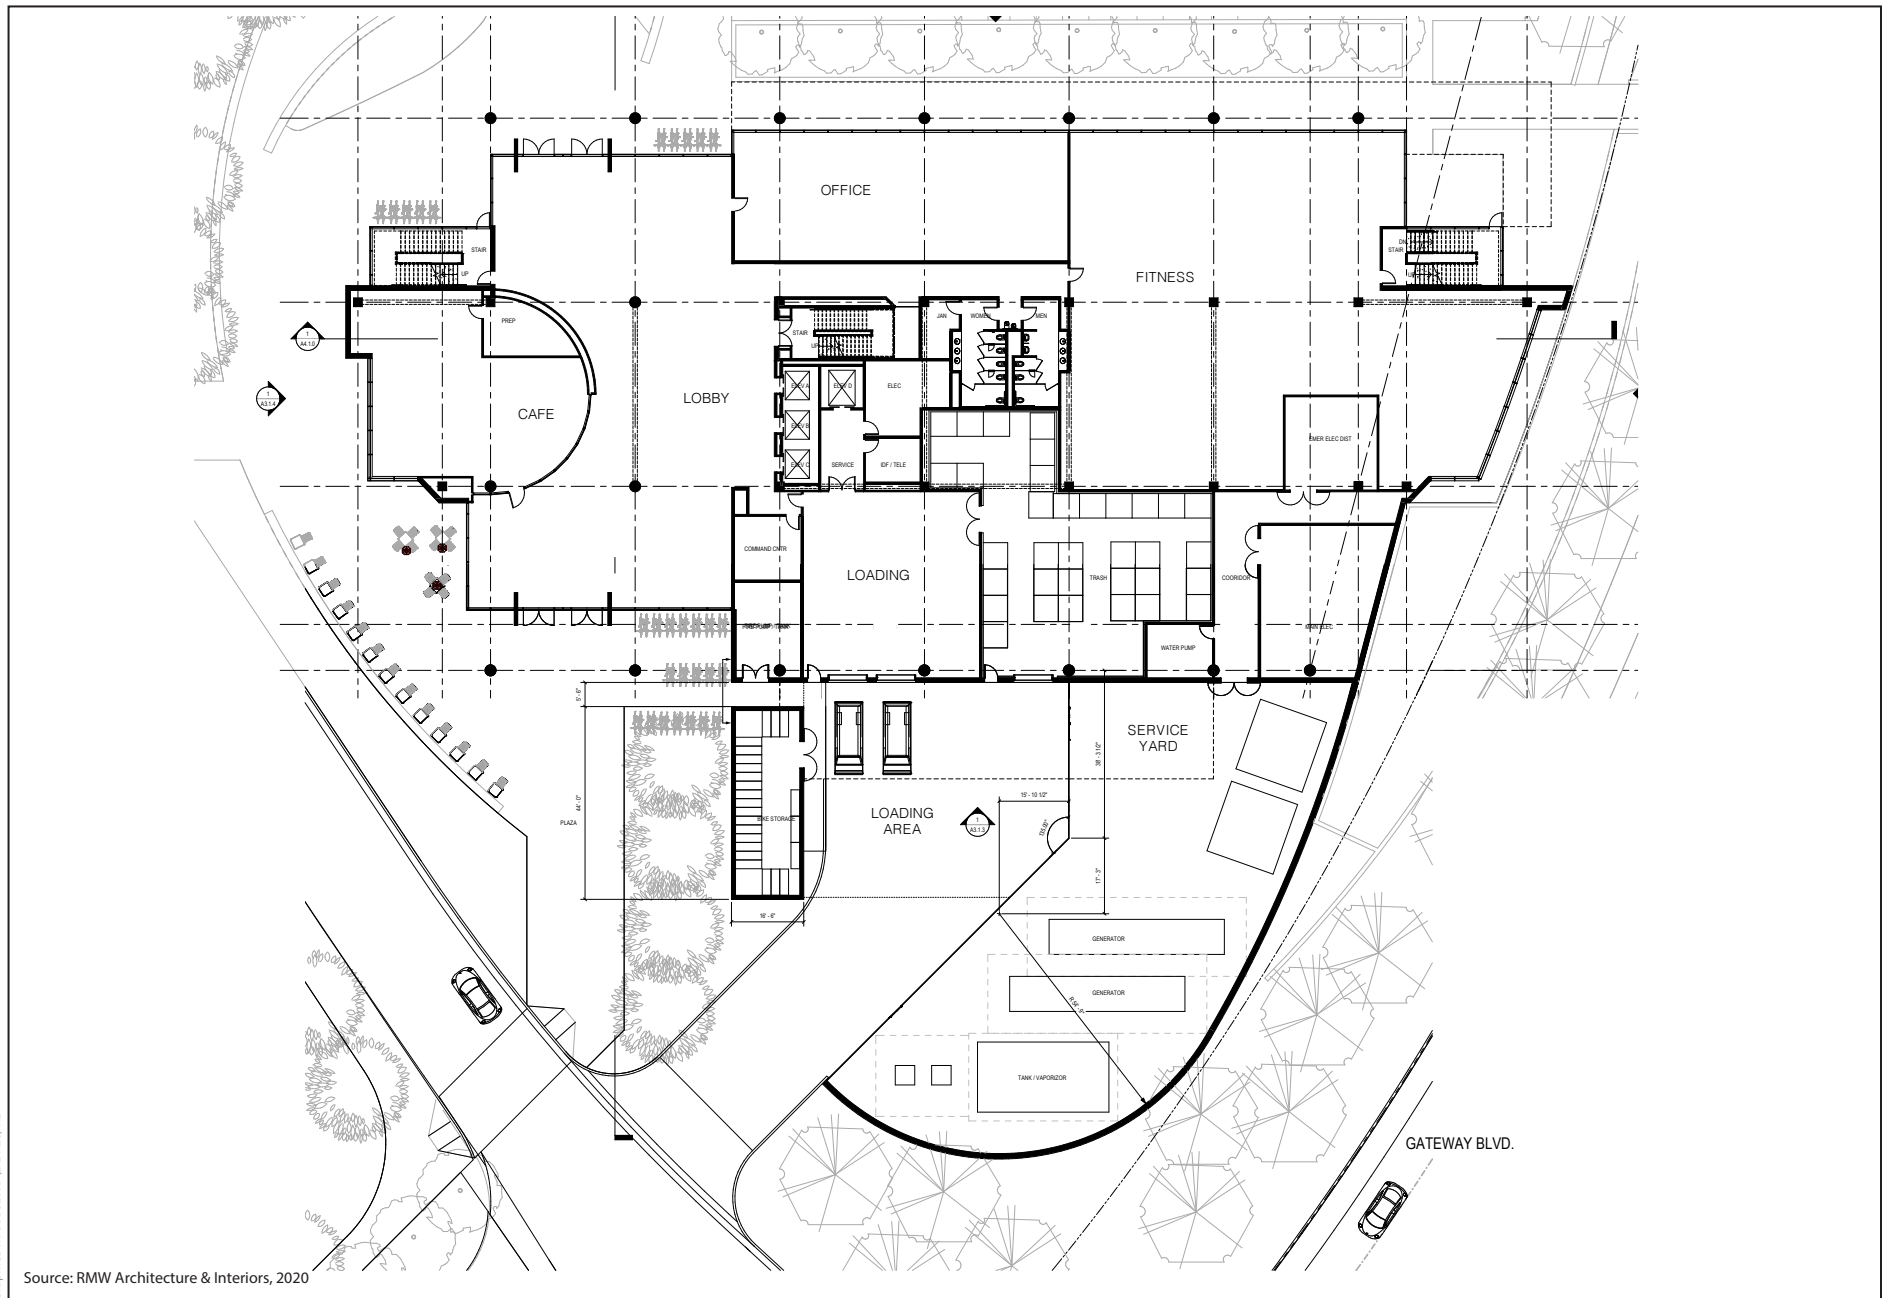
and Figure 3-6 show the interior configuration for the proposed building. The ground floor (floor 1) of the proposed building would include a “through lobby” with access from the north and south in the western portion of the building. The lobby would include an amenity space, including a café, which would be open to the public. In addition, floor 1 would include a fitness center, which would only be open to occupants of the Gateway Campus. Floor 2 would include additional lobby space. Floors 3 through 7 would be used for R&D and office space. Figure 3-7 and Figure 3-8 show the elevations for the proposed building.
